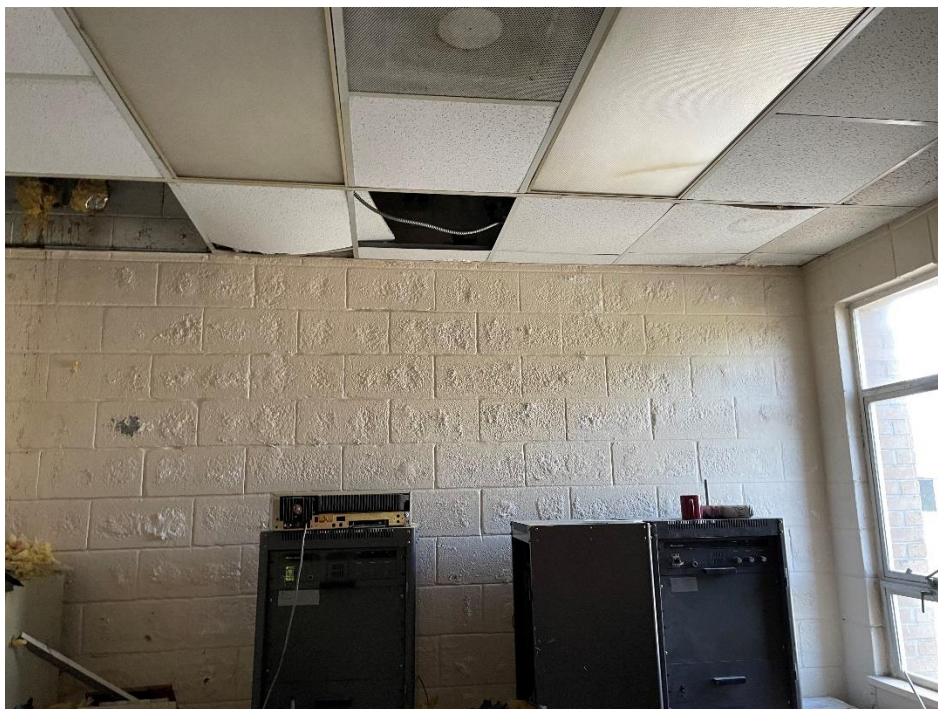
View of the second floor back room to the right where sunlight (exterior penetrations) were observed along with animal activity.
